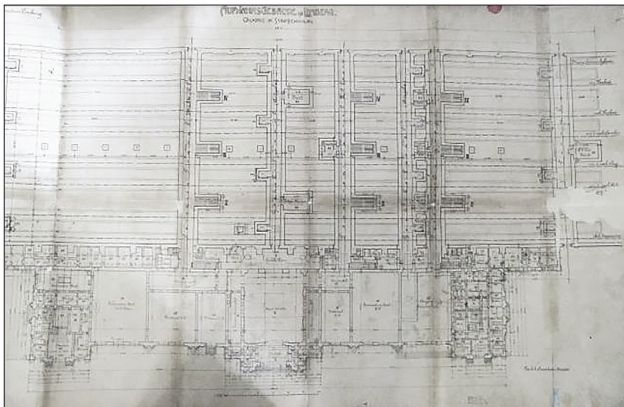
Fragment of the plan of the first (entrance) level of the main hall of the Lviv Railway Station
